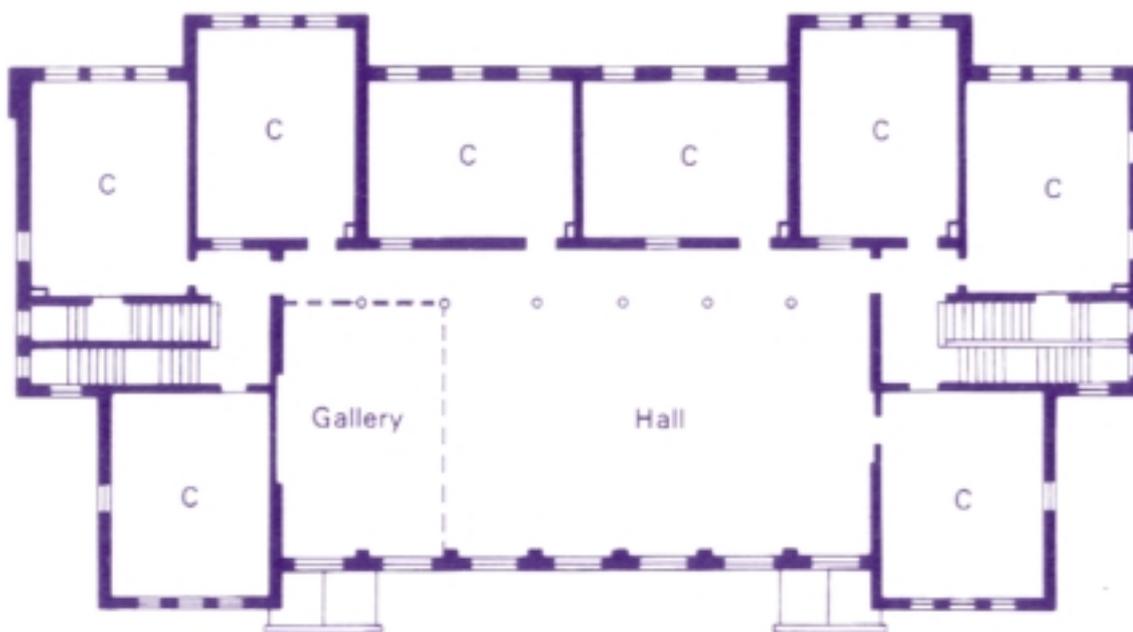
Central hall design, Jonson Street Board School, 1873 (Seaborne and Lowe, 1977, p. 26)
